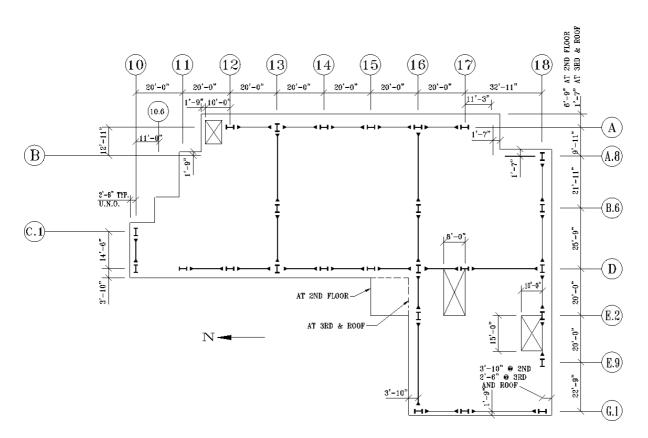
Typical floor framing plan for building of Example 8-3 (Opening shown exist on second and third floors only)
